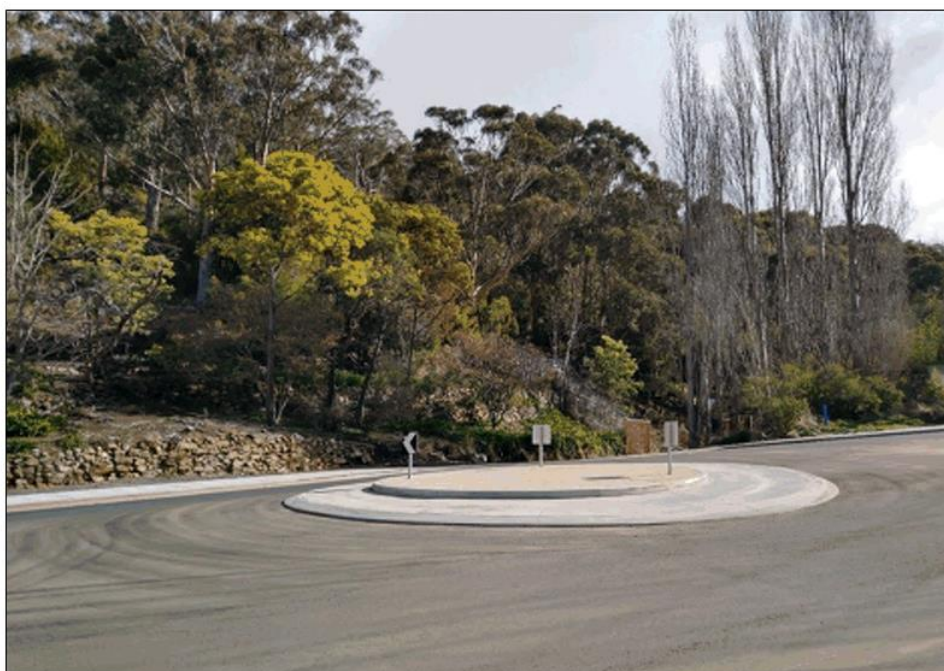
New Roundabout at the entrance of the HCC Disposal Area
